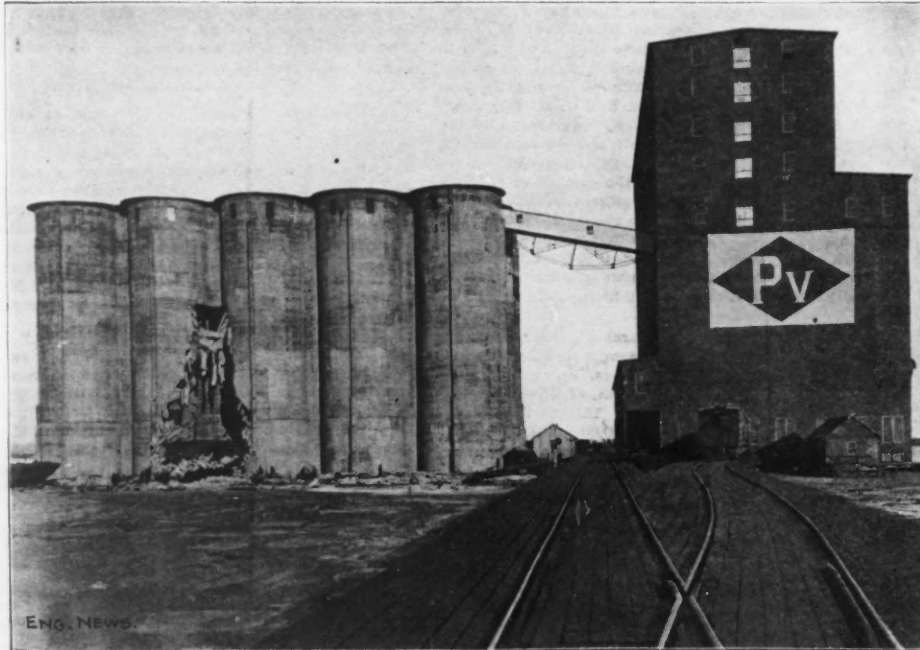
VIEW SHOWING THE BREAK IN CONCRETE STEEL ELEVATOR BINS AT DULUTH, MINN.
